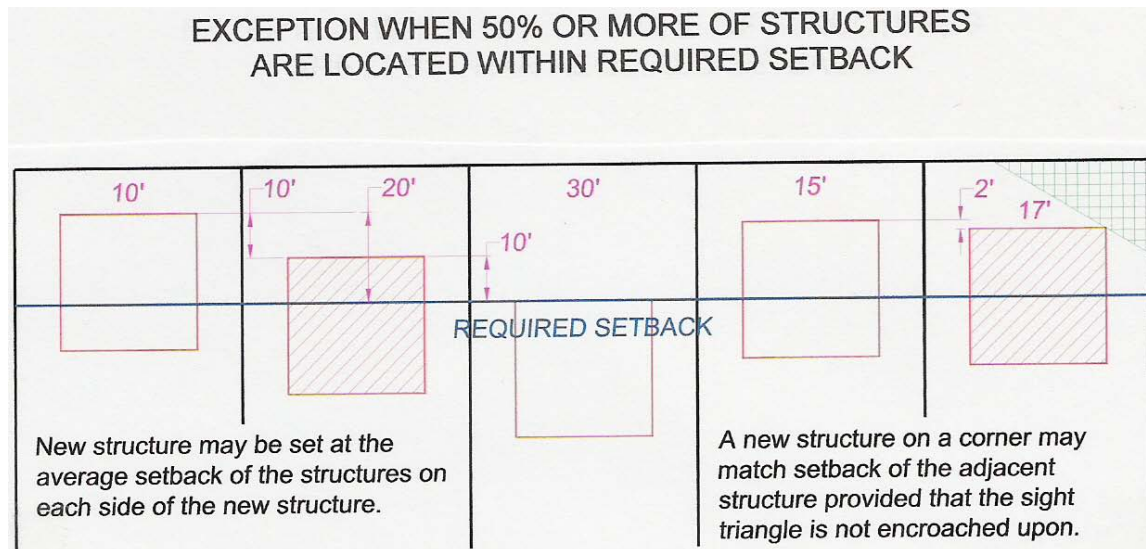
BUILDING SETBACK LINE ON COLLECTOR STREETS
